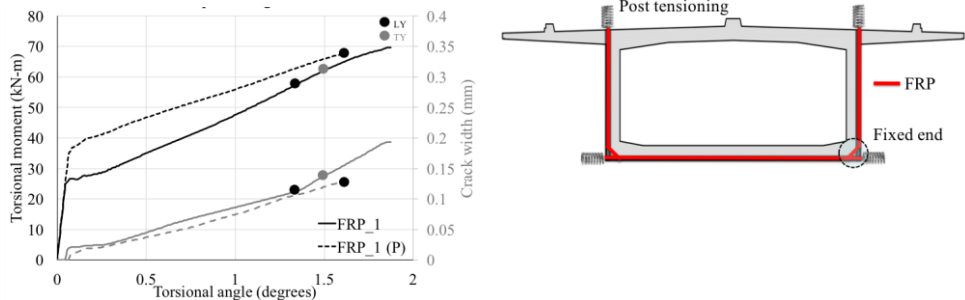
Results of strengthened beam model FRP\_1 with prestress (right); New NSM-CFRP technique for the shear and torsional strengthening of tubular type bridge sections.
